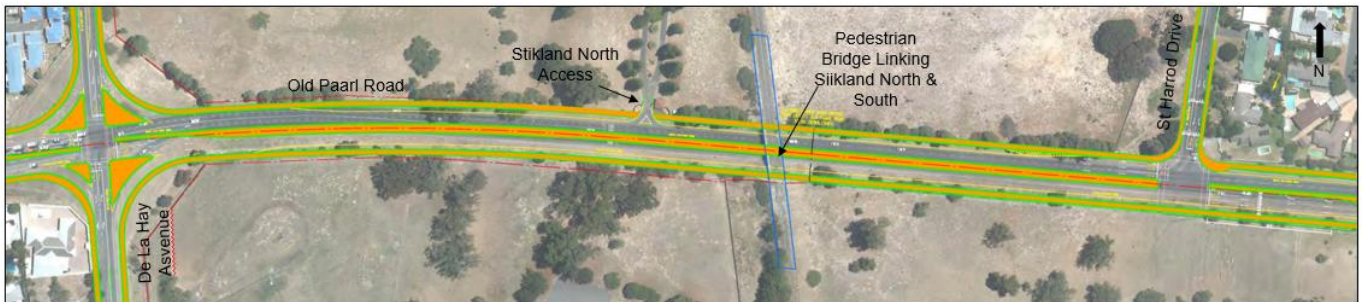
Section of Proposed Upgrade of Old Paarl Road in Vicinity of Stikland
